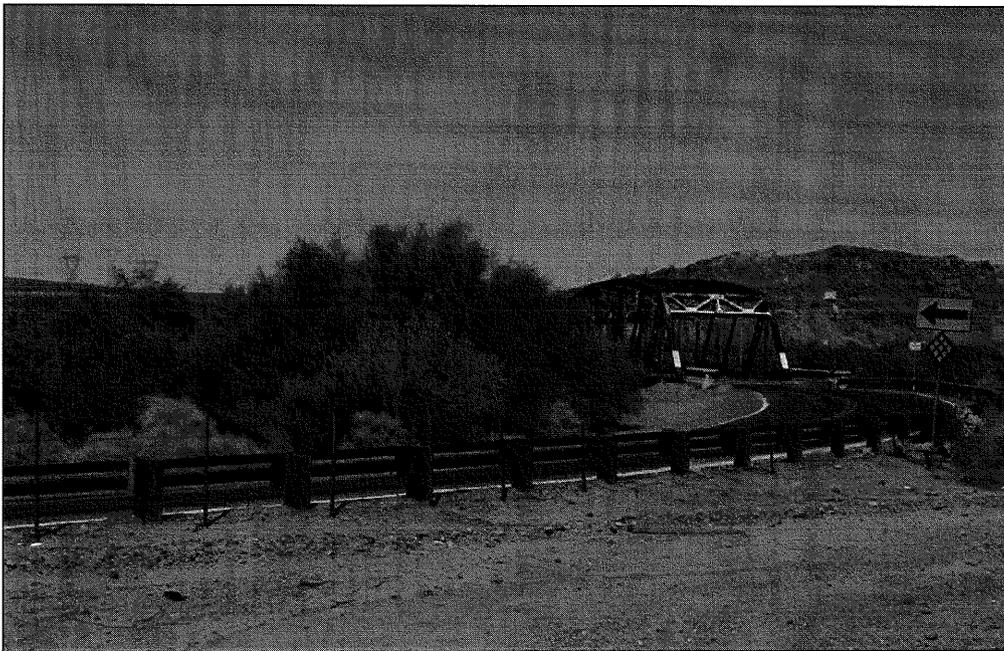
Photograph of guardrail Road Feature 6 on Road Segment 3, AZ FF:9:17(ASM) on the eastern approach to Gillespie Dam Bridge, facing northwest.
